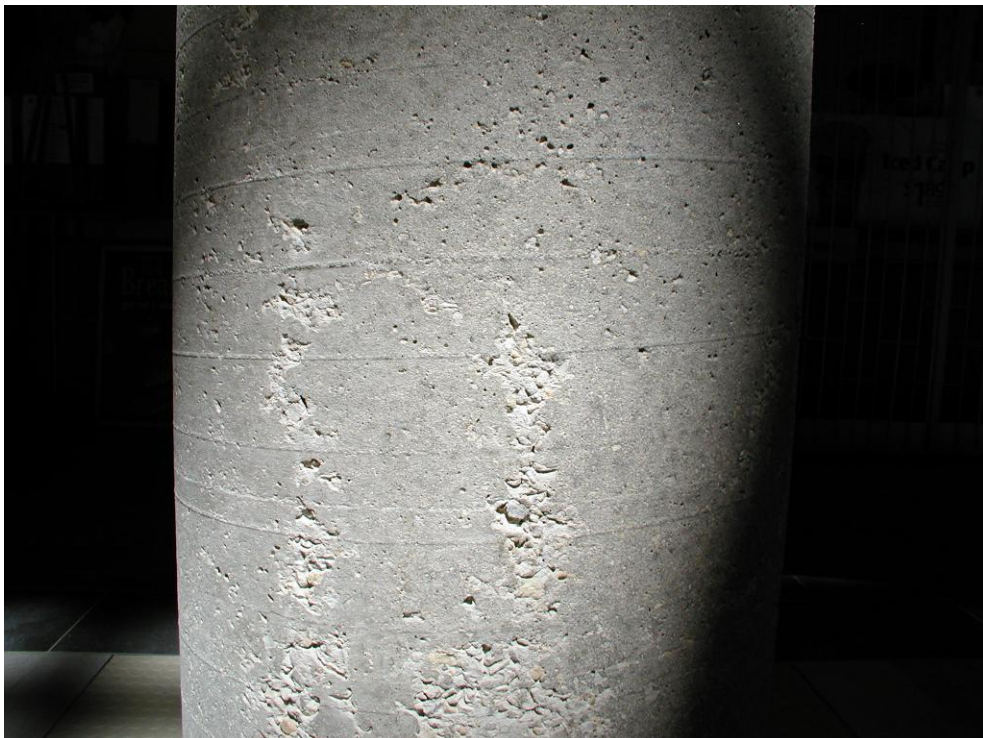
Bug holes and imperfections of a conventionally formed concrete column
